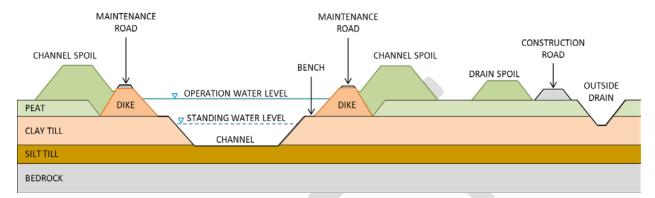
Typical Cross Section of the Lake St. Martin Outlet Channel
